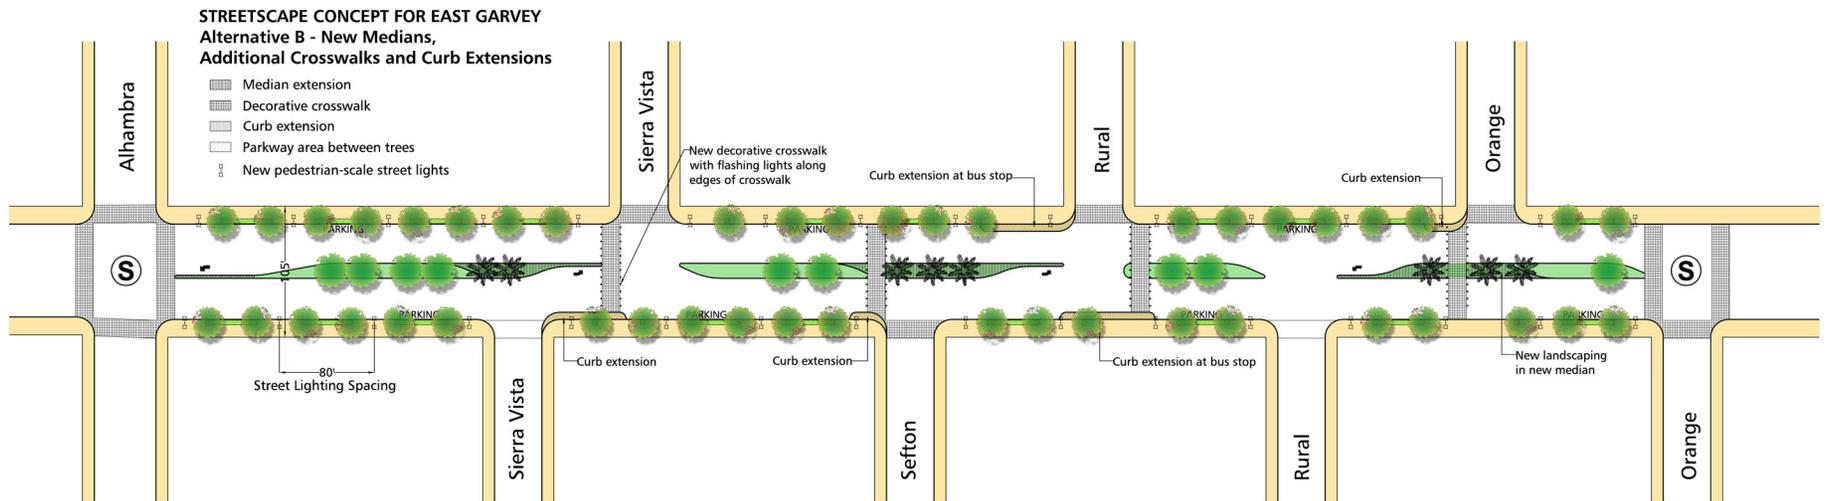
East Garvey Avenue streetscape concept, Alternative B.
